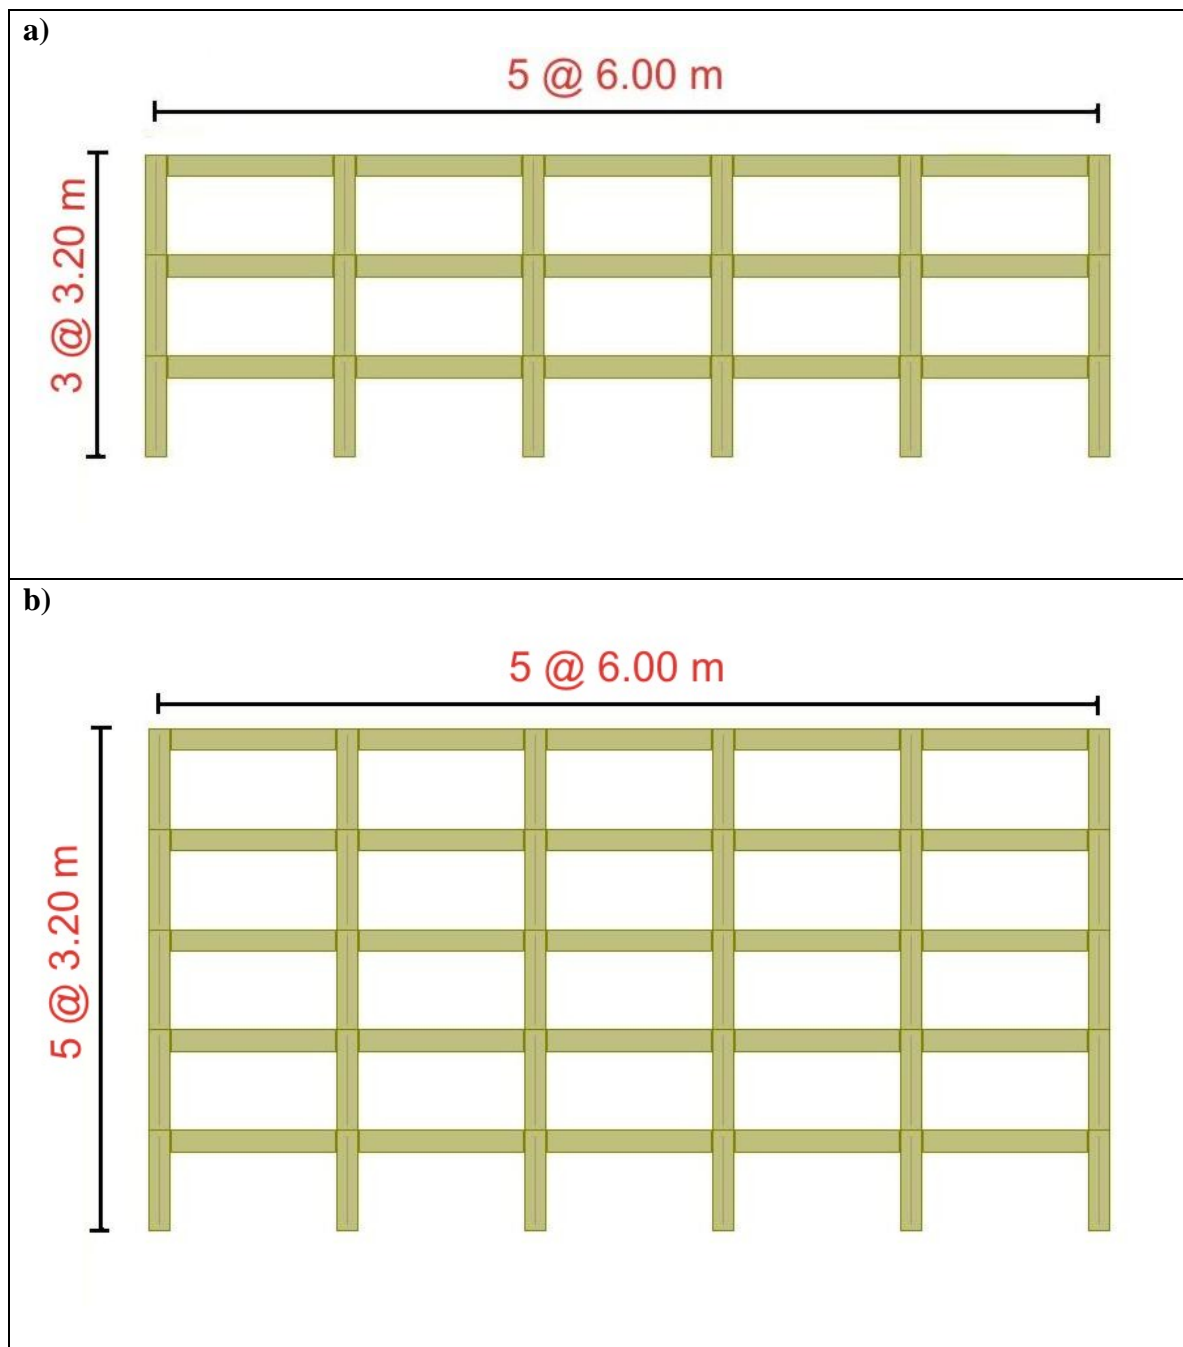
Elevation view of buildings considered: a) 3-storey building b) 5-storey building
